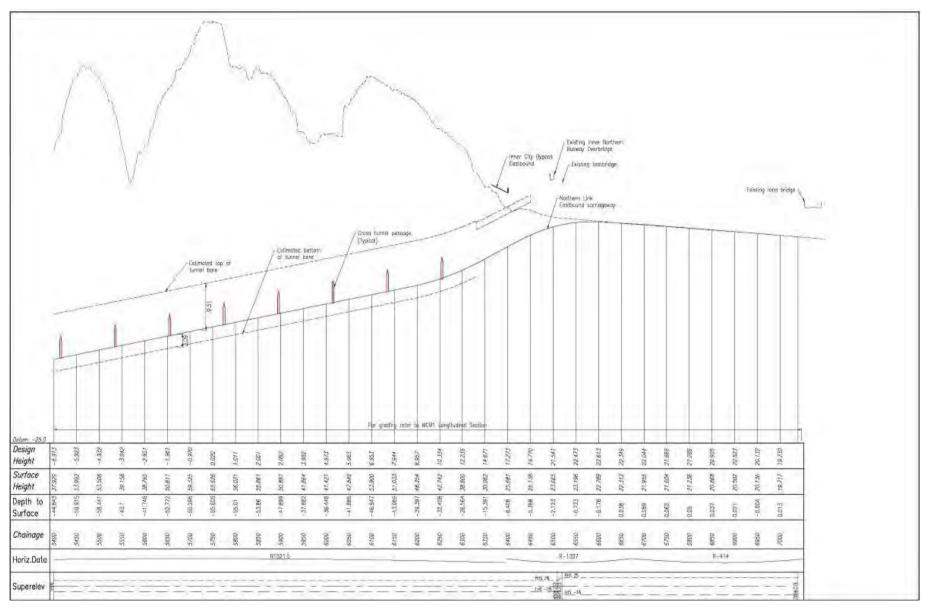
Eastbound tunnel vertical alignment –ICB Connection
